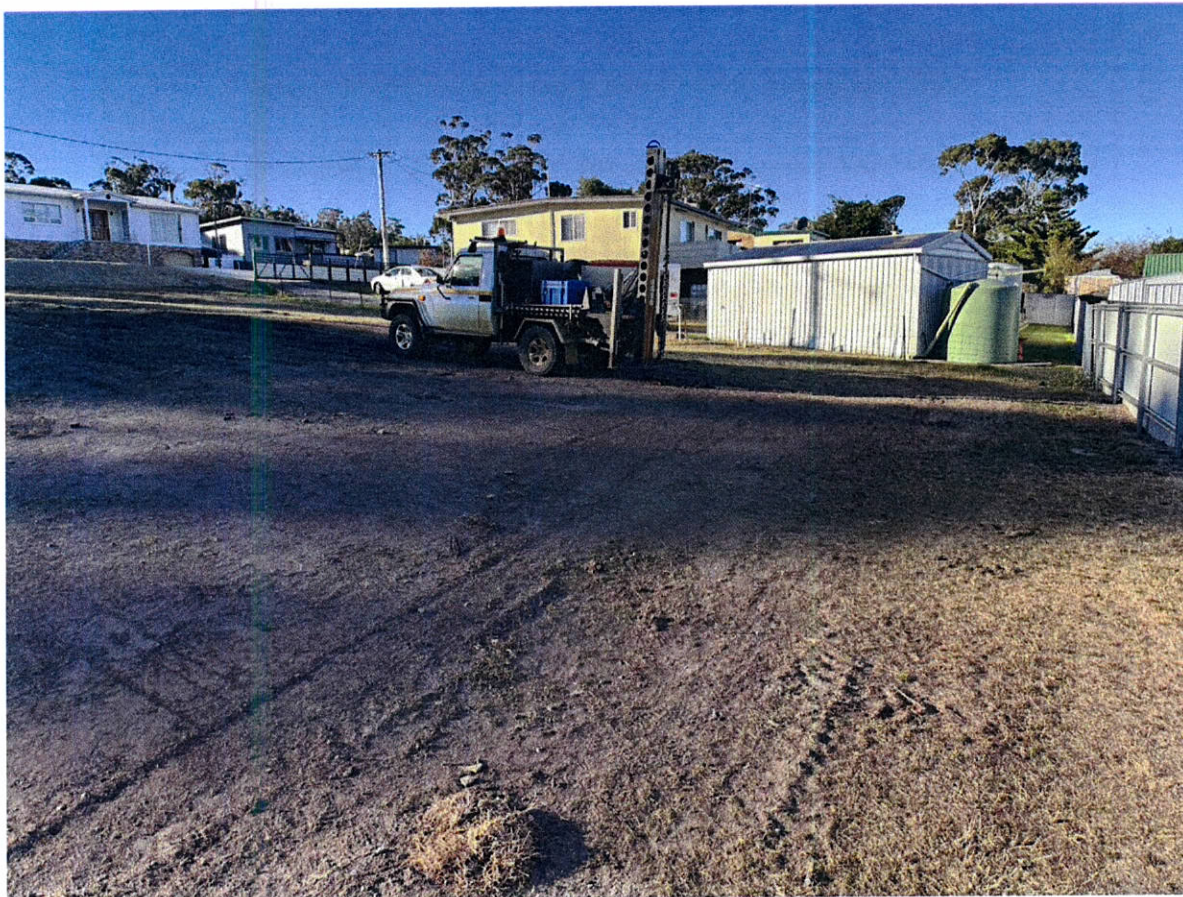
Test Hole #1 – looking to the northeast from Norfolk Crescent.
